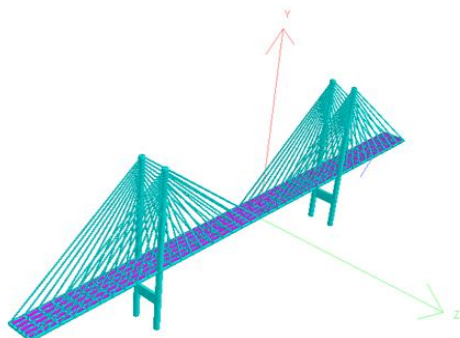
Double-Shaped Pylon Cable-Stayed Bridge
